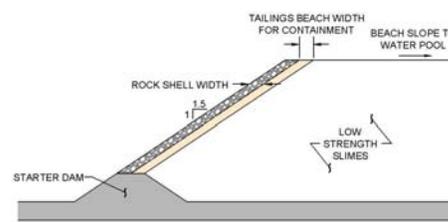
Idealized study section with rock fill shell on steepened exterior dam slope
